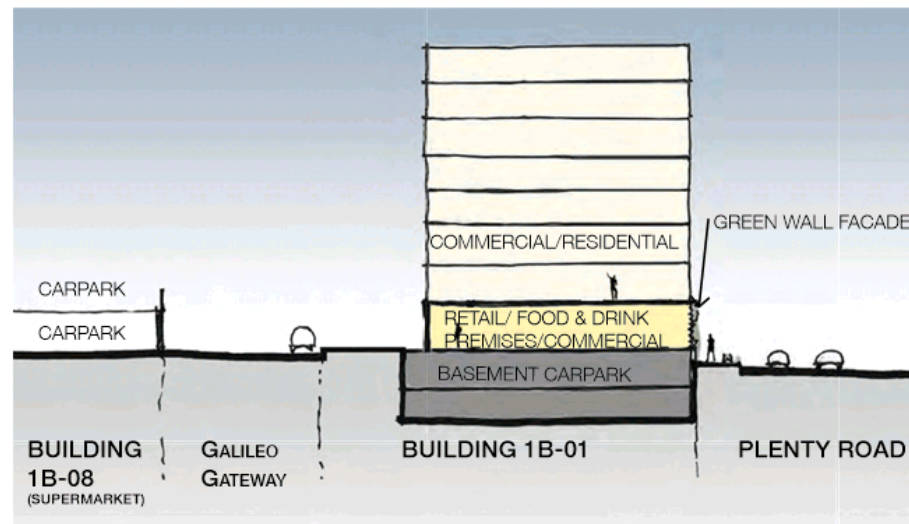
Indicative Section through buildings fronting onto Plenty Road
